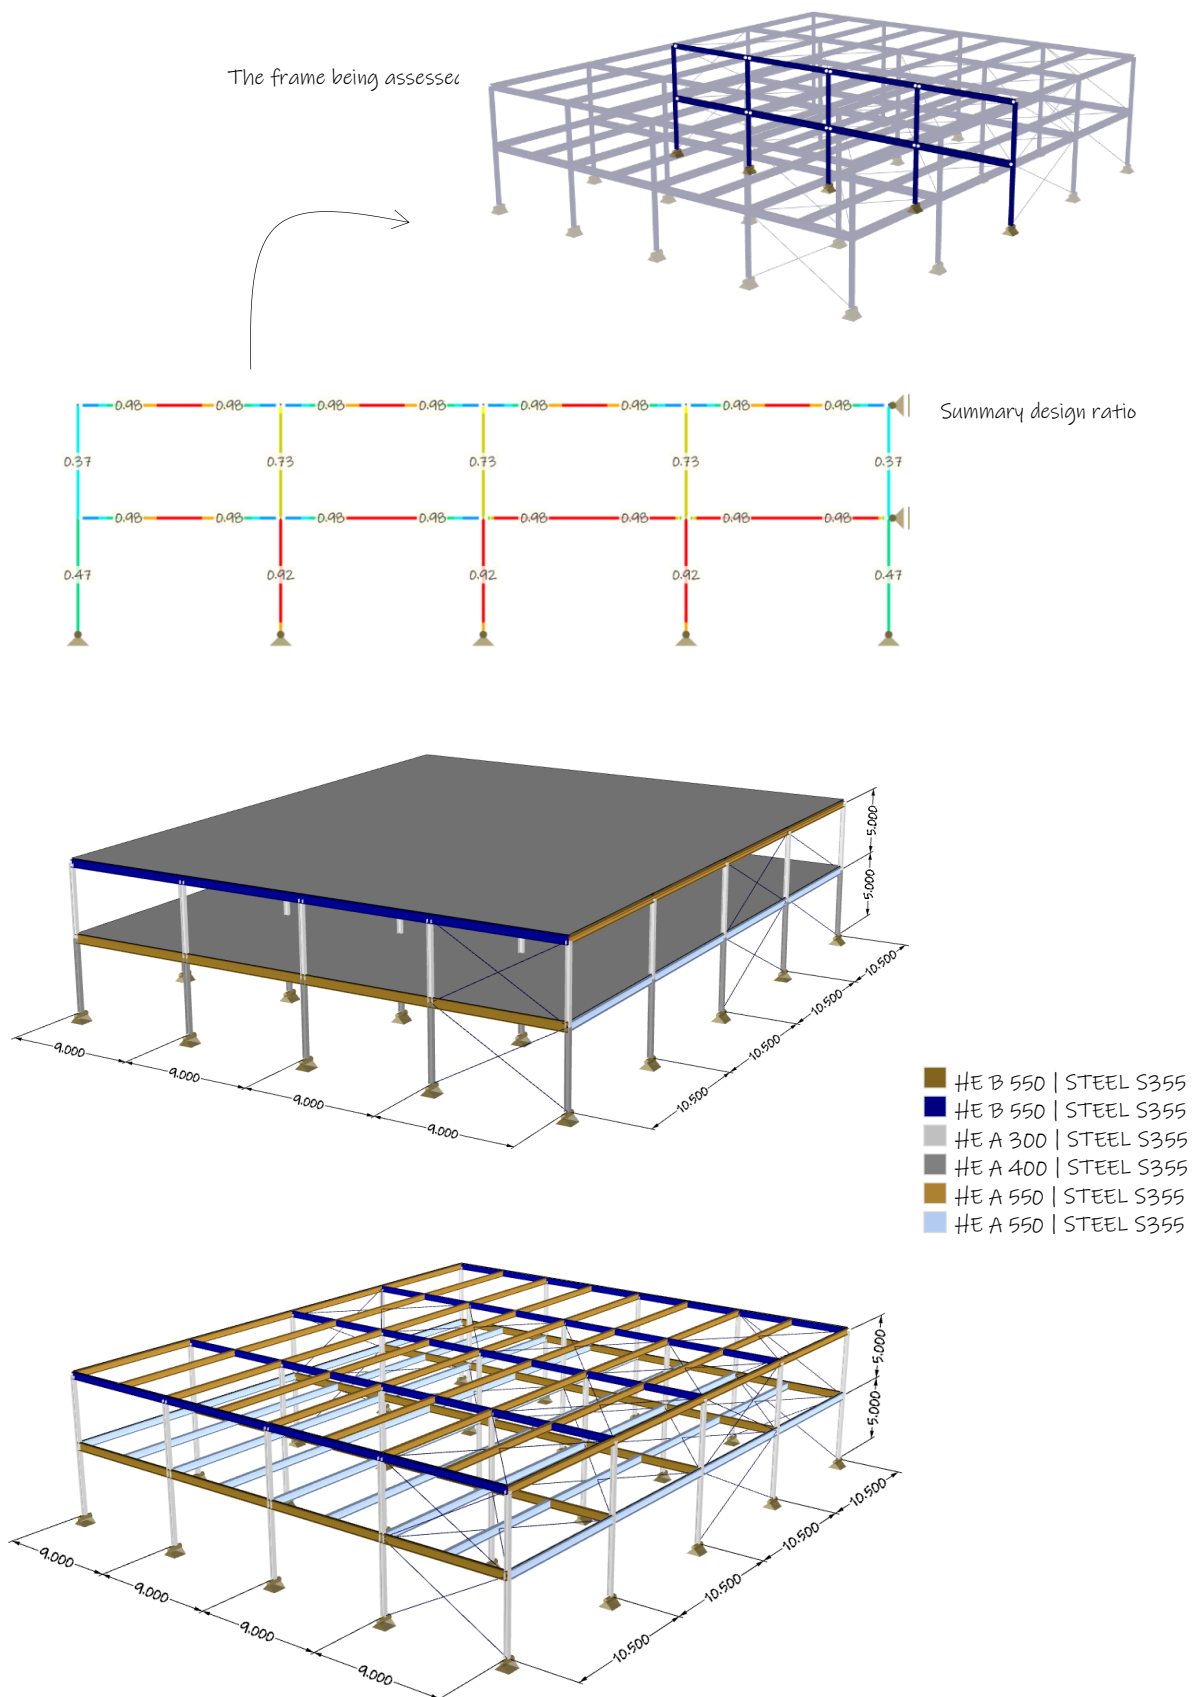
Summary DA05 main frames' design ratios in 2D and a comprehensive 3D overview of the structural system, highlighting the load-bearing elements and cross-sections of DA05's demountable convertible design.
